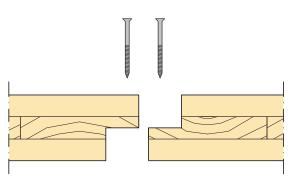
Wall - wall Source: Trada WIS 2/3-61; Redrawn by the author
